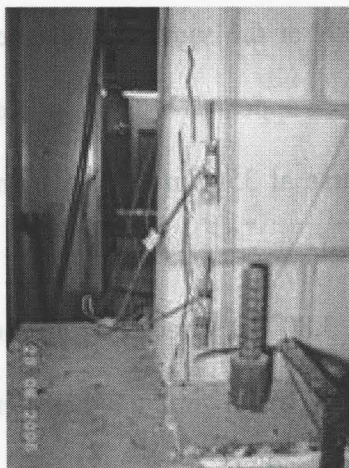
81: Face shells cracking at the East toe at 35 mm top deflection (Wall 7)
